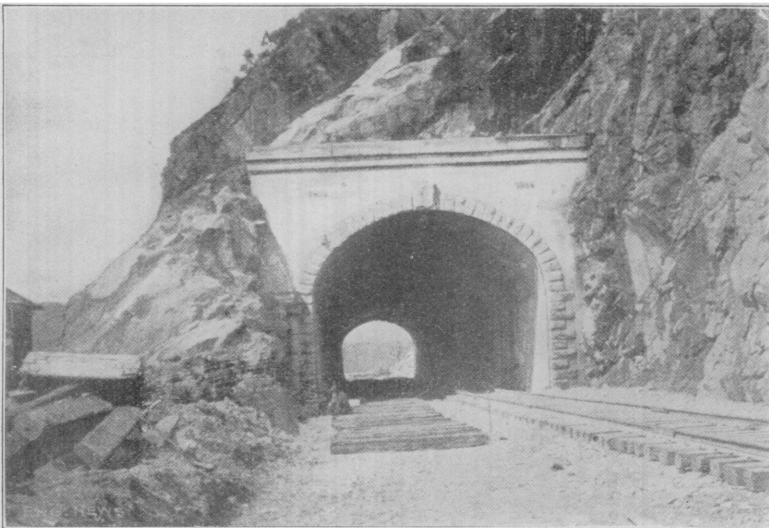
South Portal of Peekskill Tunnel, New York.
